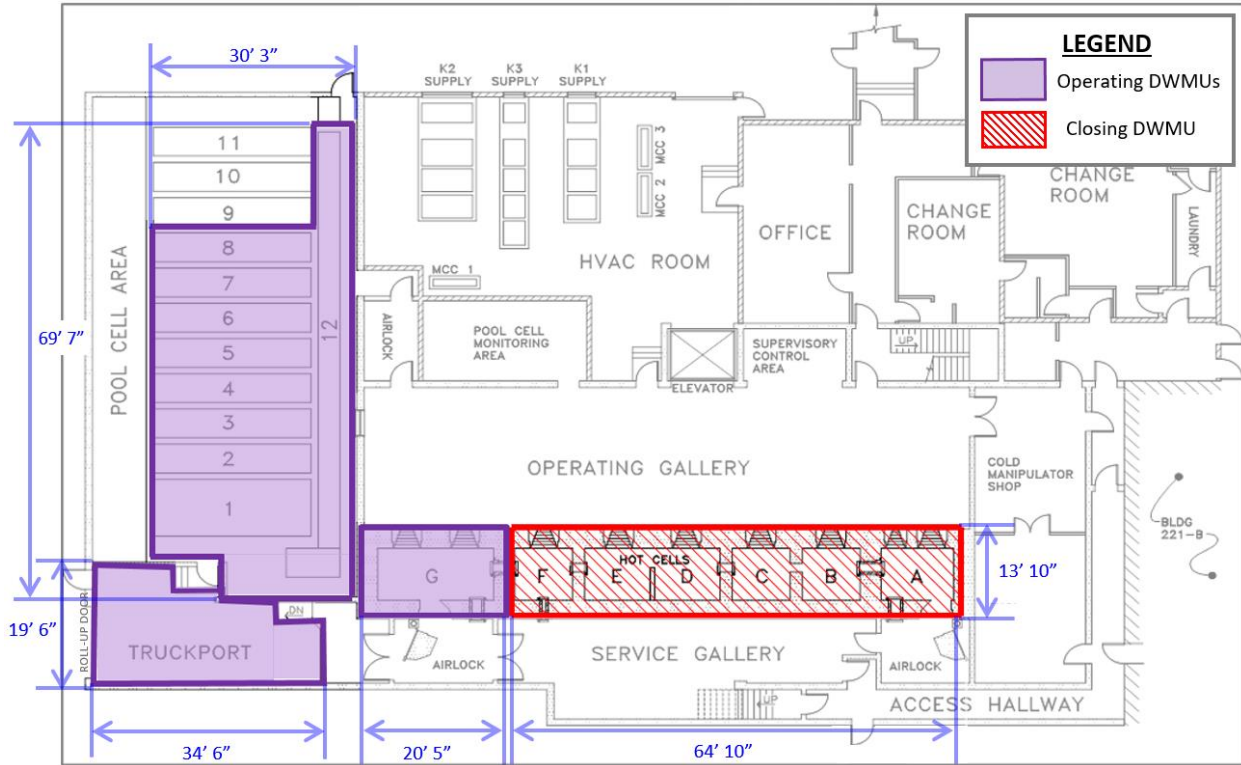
Waste Encapsulation and Storage Facility First Floor Plan
